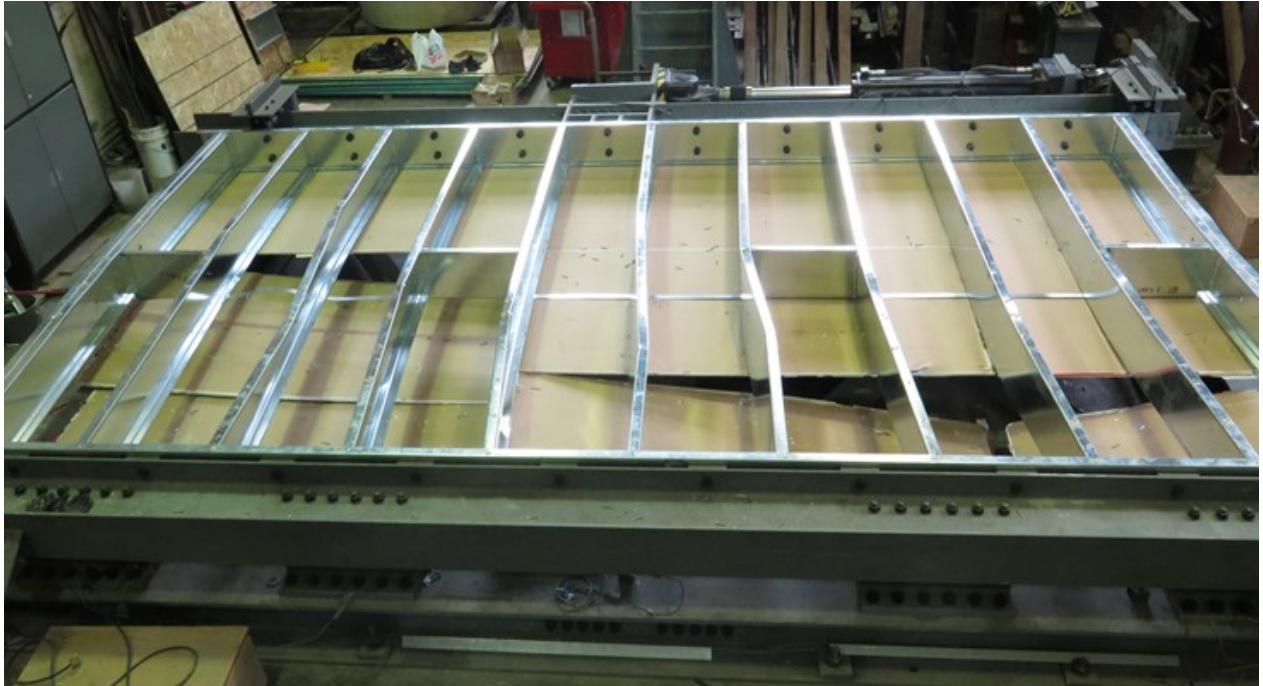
14-RGYP-M Specimen Post-Test with OSB Panels Removed
